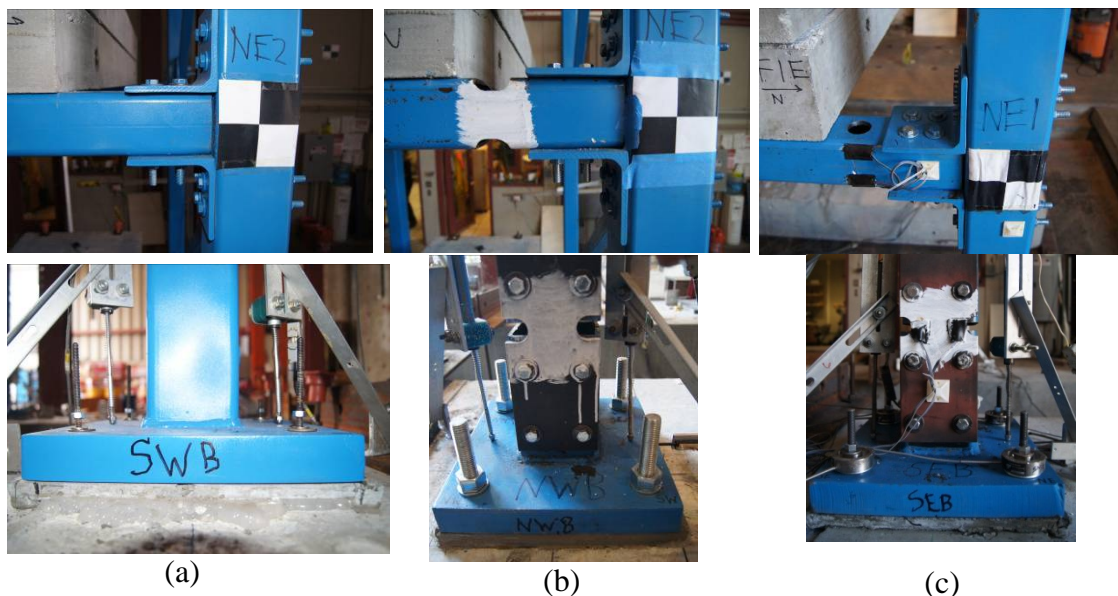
Finished in-situ beam and column fuses: (a) Configuration 1, (b) Configuration 2, (c) Configurations 3-5
